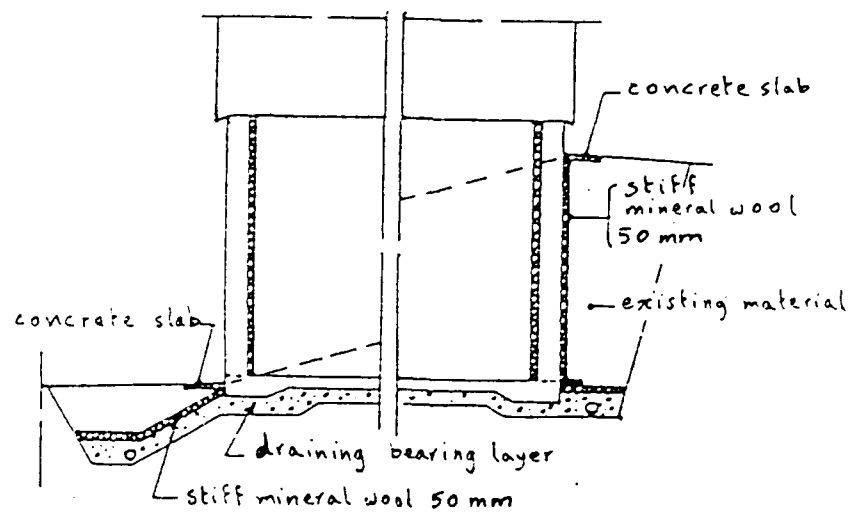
Recommended design of a basement foundation where one basement wall is exposed to outside air.
